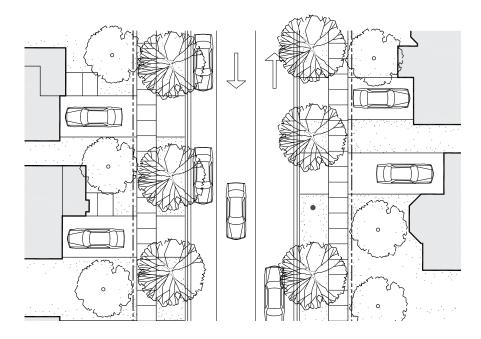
Low Density Residential / Local Road Streetscape - 17.0m R.O.W. / 2 travel lanes / on-street parking on one side / 4.05m
